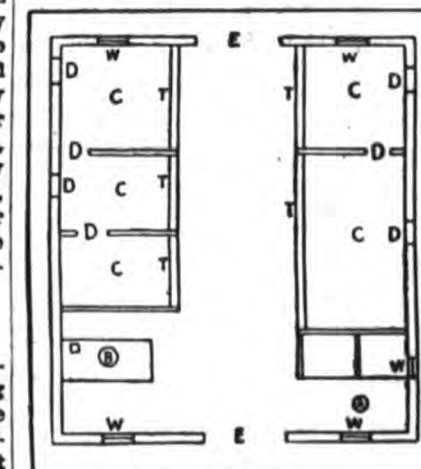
FLOOR PLAN OF HOGHOUSE.
